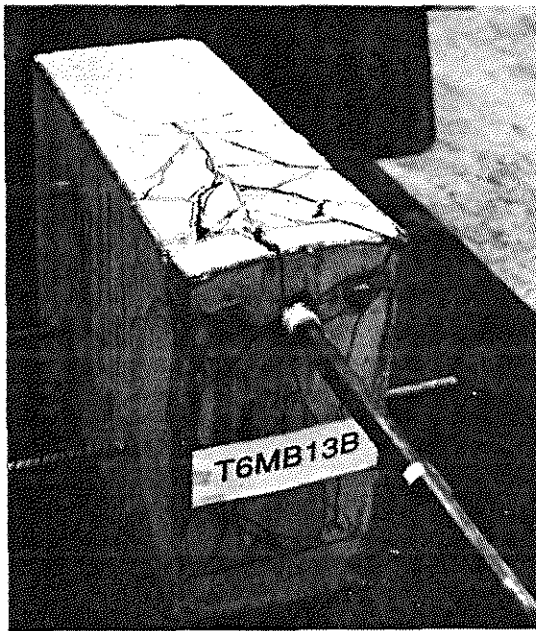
Beam-end test specimens with transverse reinforcement after failure
